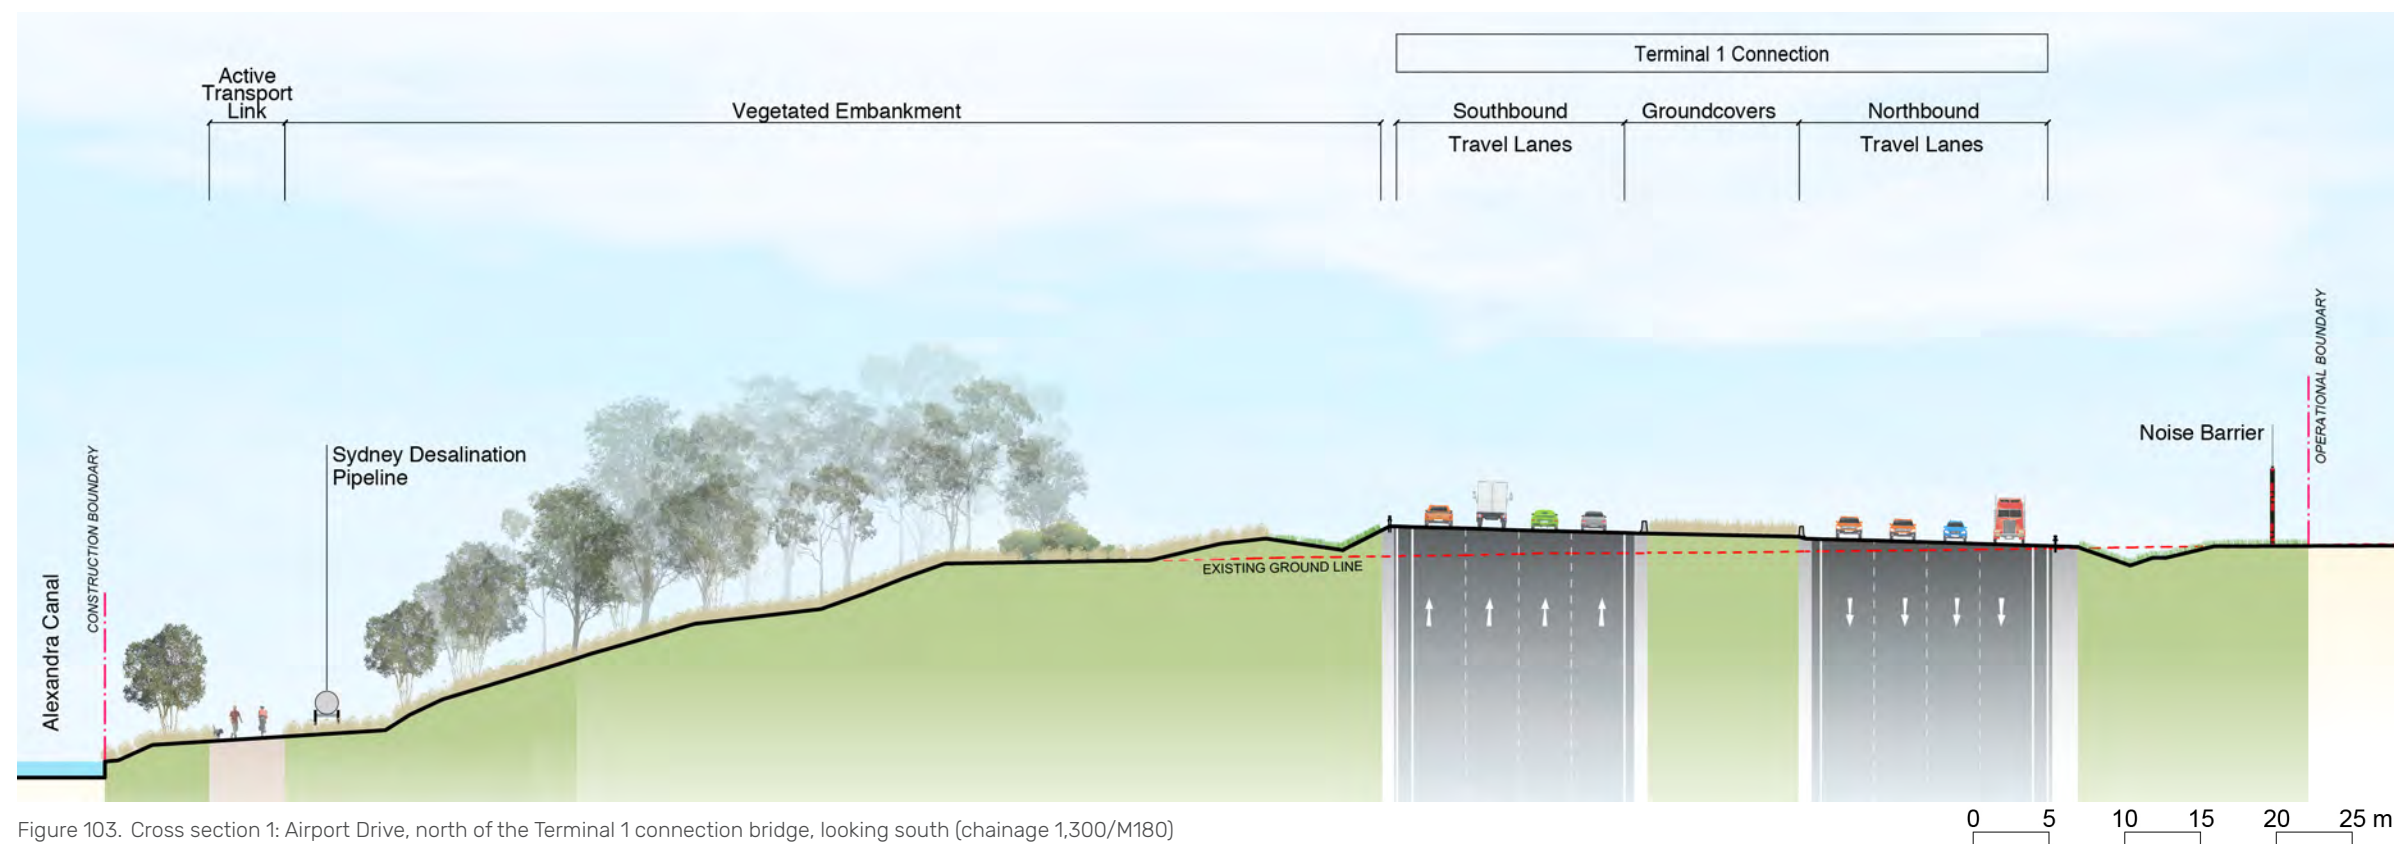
Cross section 1: Airport Drive, north of the Terminal 1 connection bridge, looking south (chainage 1,300/M180)
